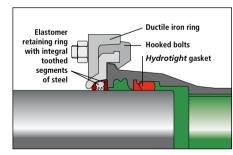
View in section of the Hydrotight external friction locking joint
